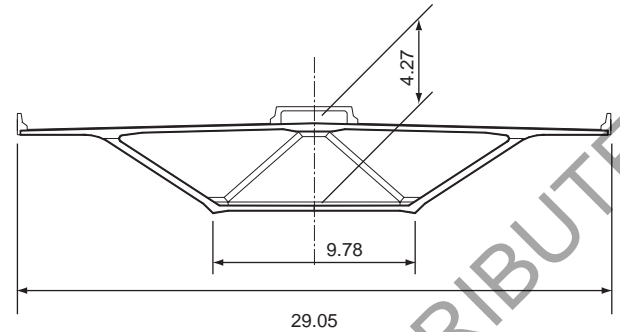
Concrete torsion box deck – Sunshine Skyway Bridge, USA (all dimensions in metres)
